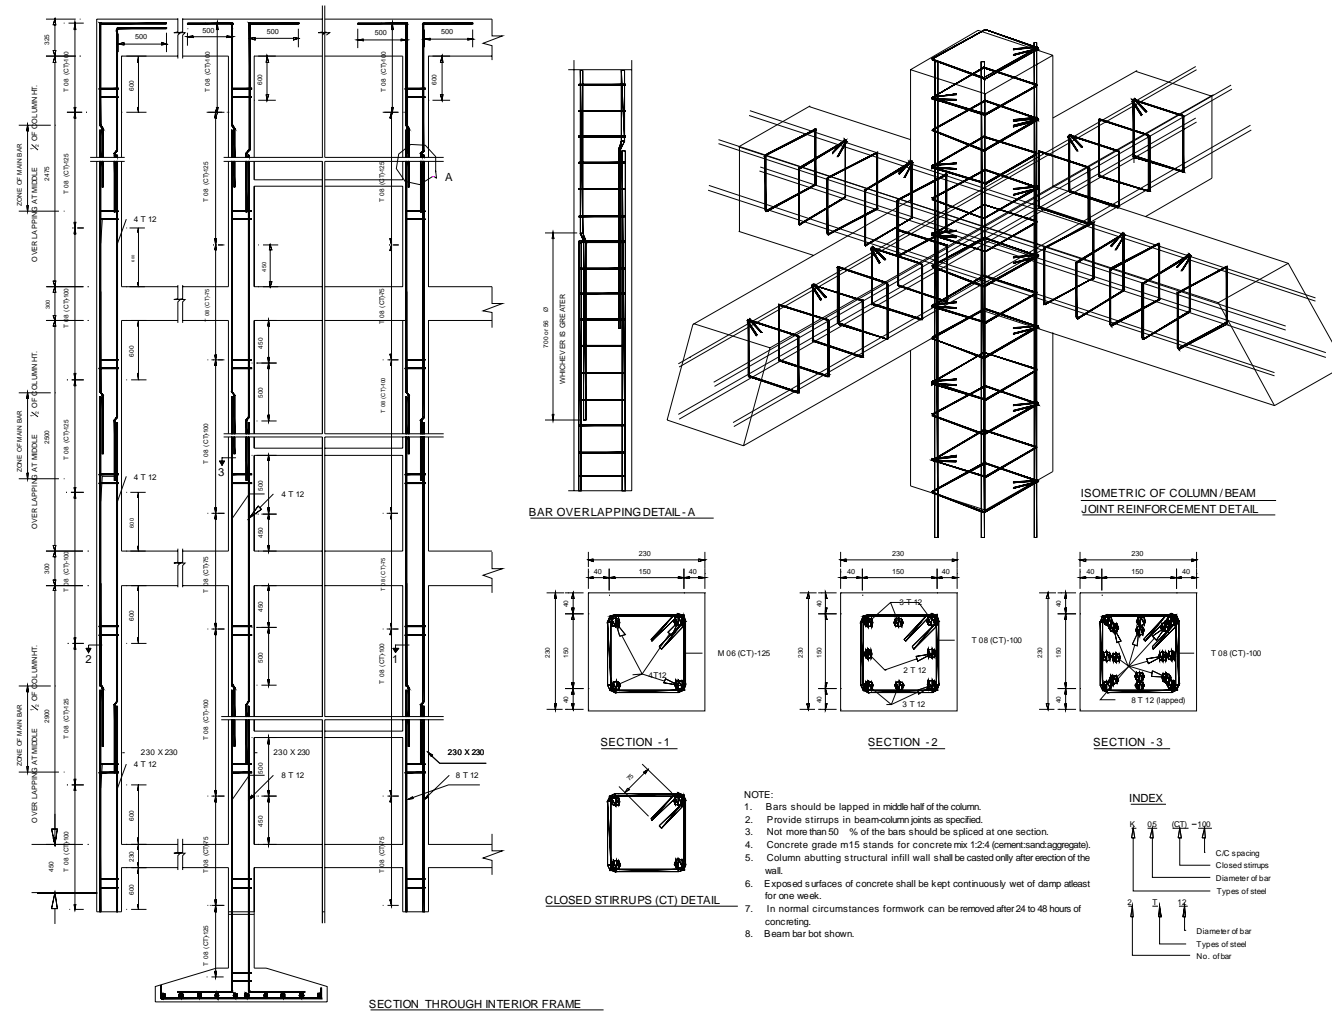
Column Detail (two walls each way / 100 m²)
